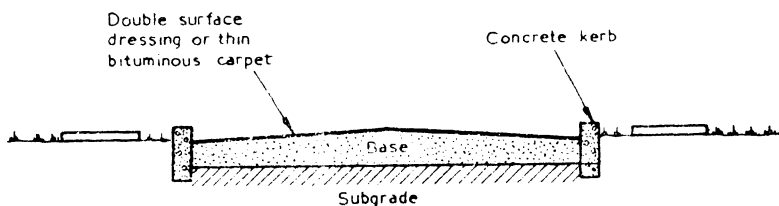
SECTION OF TYPICAL SOIL ROAD FOR URBAN USE
